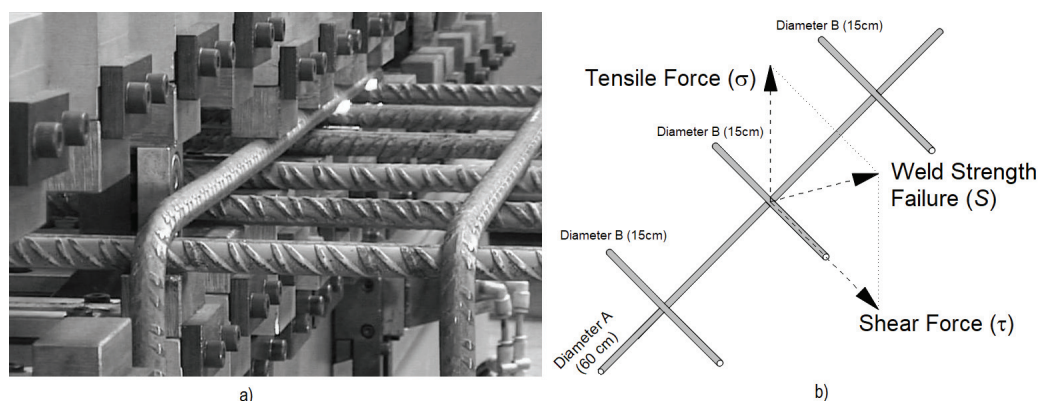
(a) Fusion welding of reinforcement bars. (b) Test bar configuration and weld strength failure (S).
